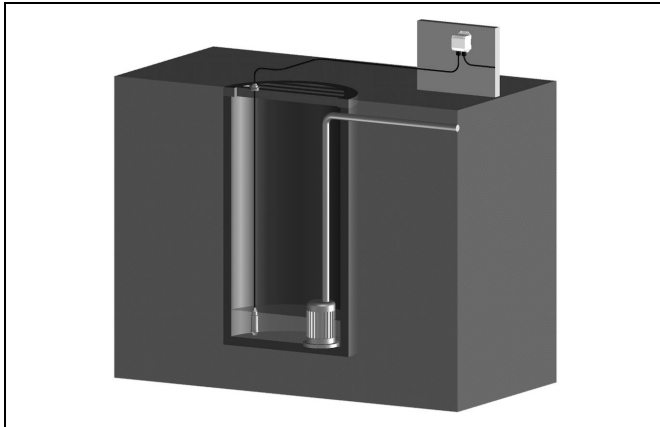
VEGAWELL 52 in a pump shaft with VEGABOX 02
